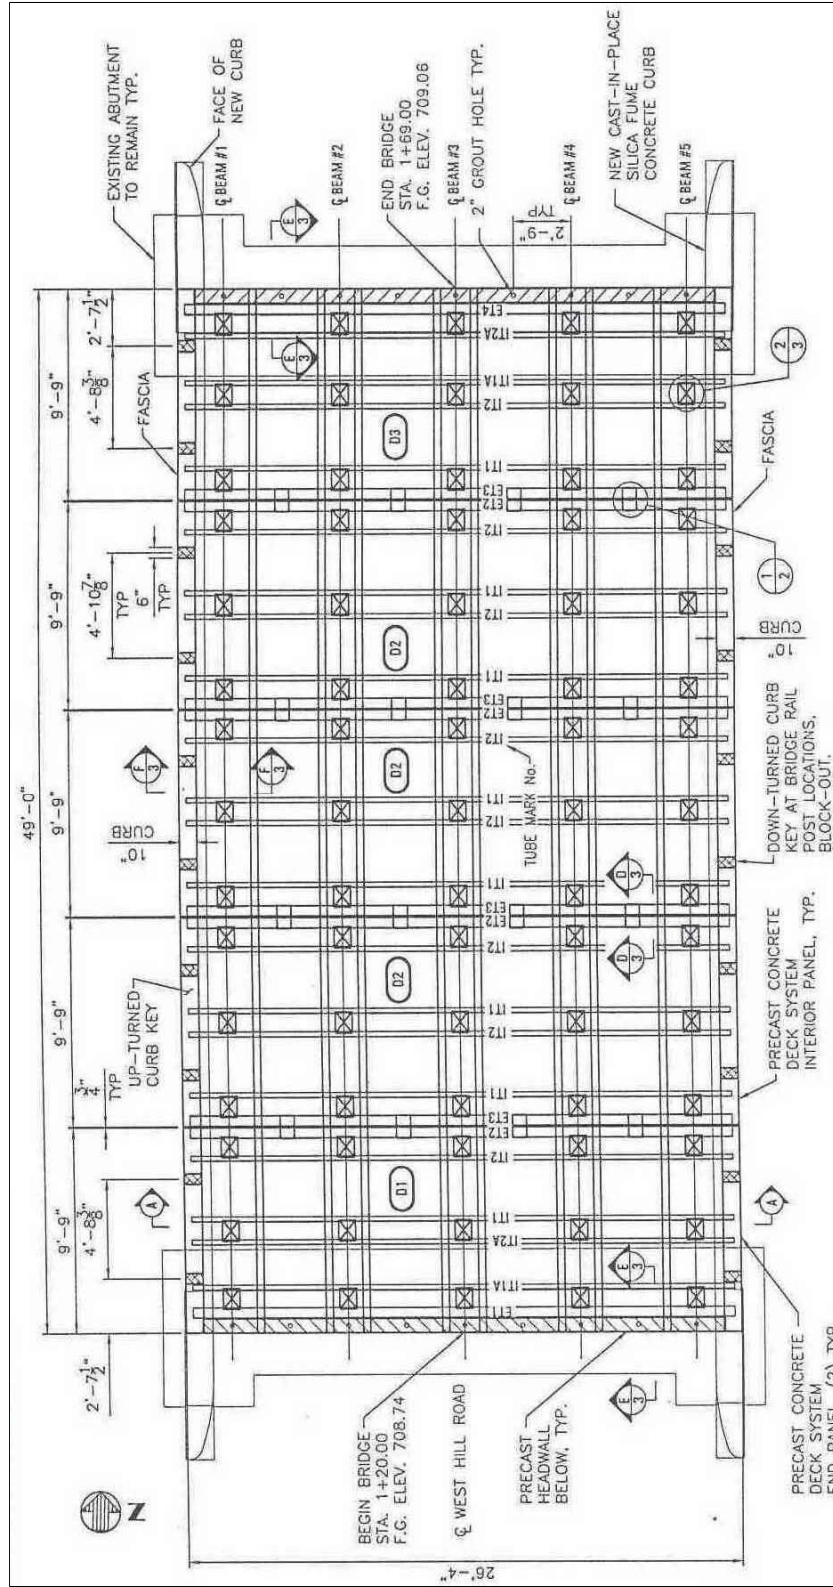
Deck plan view of bridge over Little River Town, Stowe, VT (The Fort Miller Co., Inc., 2000)
